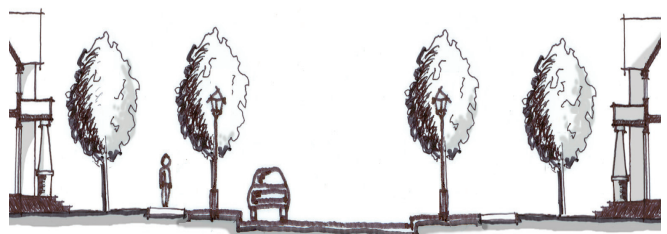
Typical Residential Street Section—illustrates a street lined with continuous building frontage, street trees, generous sidewalks, decorative lighting (if possible) and on-street parking.
